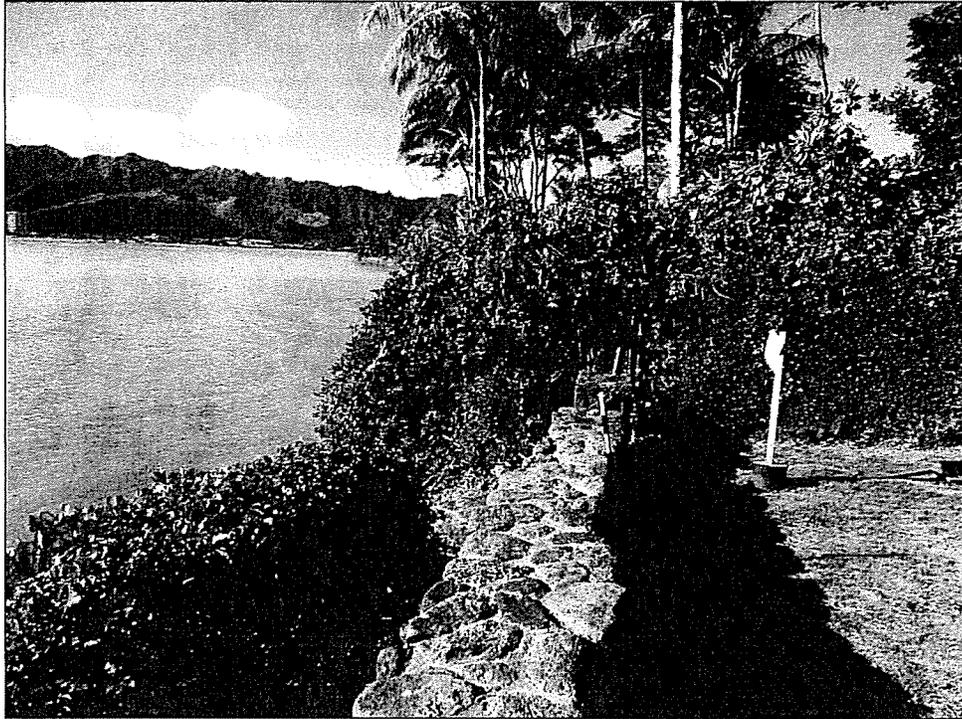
Rock wall along coast, northwest corner of property; wall has a small wooden gate to provide access to the water (CSH photo)
